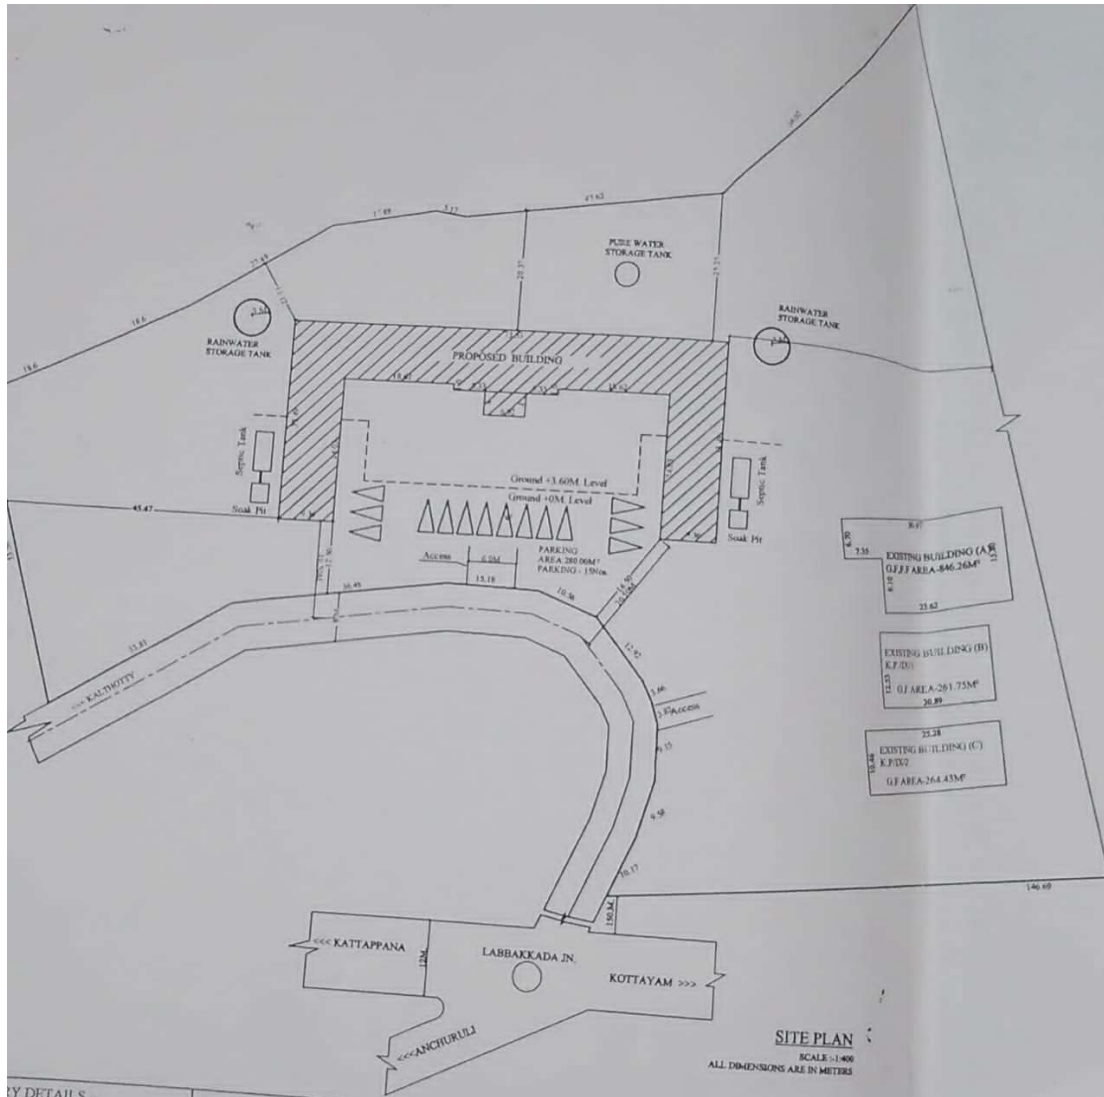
, Site Plan and Layout of JPM Arts and Science College, Kanchiyar
